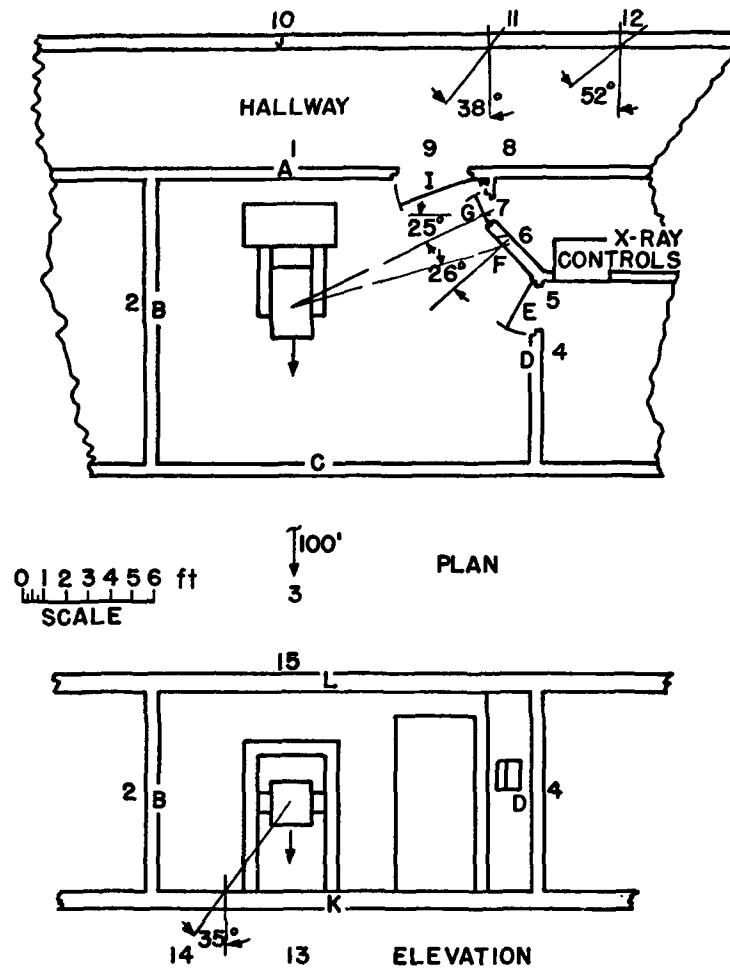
Plan and elevation views of sample 250-kvp therapy installation.
